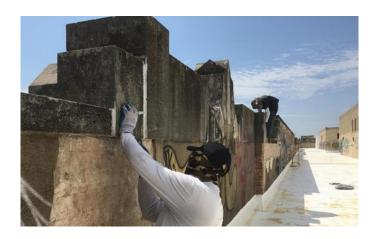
9.6.18 -- South Parapet Limestone Cap Joint Sealant Prior to Mortar Dust Application
